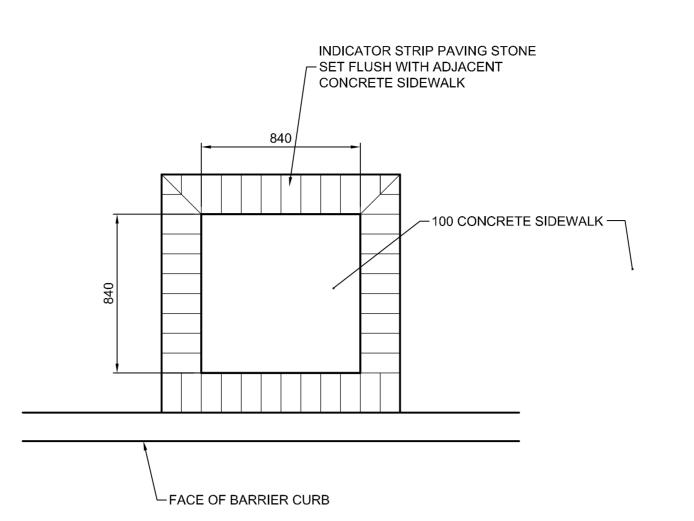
DETAIL - TRANSIT SHELTER FOUNDATION PLAN 8 19 SCALE NTS
